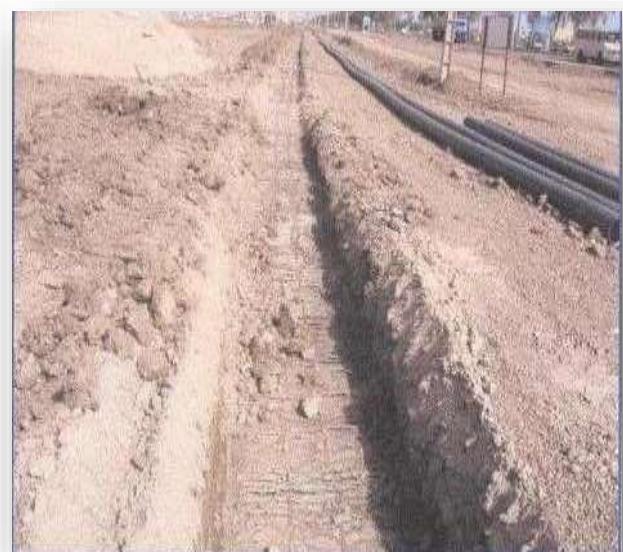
Excavation of polyethylene pipe trench - Site B of Arvand Free Zone (1388)
